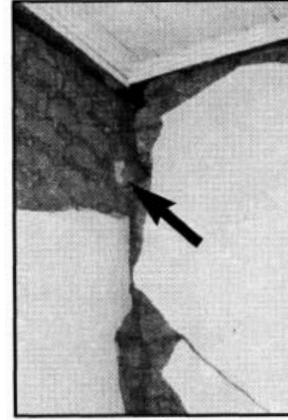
De la Osa Adobe. Separation between interior wall (right) and exterior wall (left).
